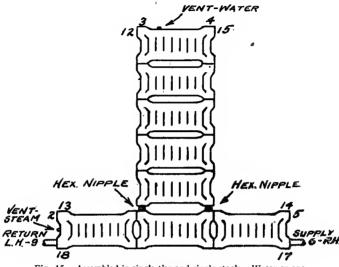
Assembled in single tier and single stack. Water or one and two pipe steam.
